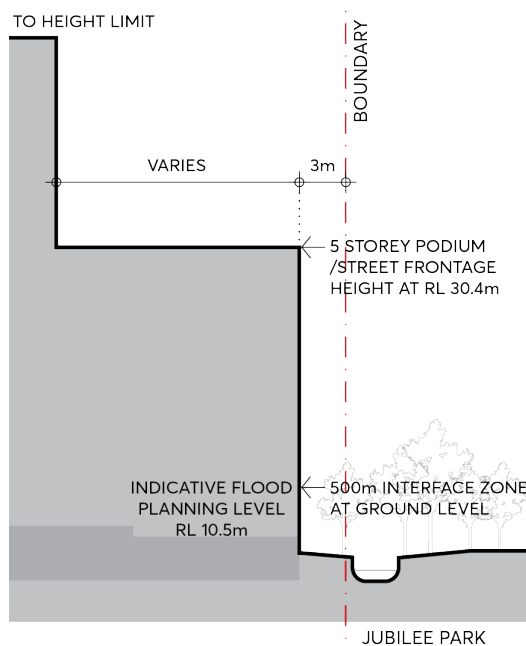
Jubilee Park (West) Street Wall Indicative Flood Planning Level is 10.74m AHD
